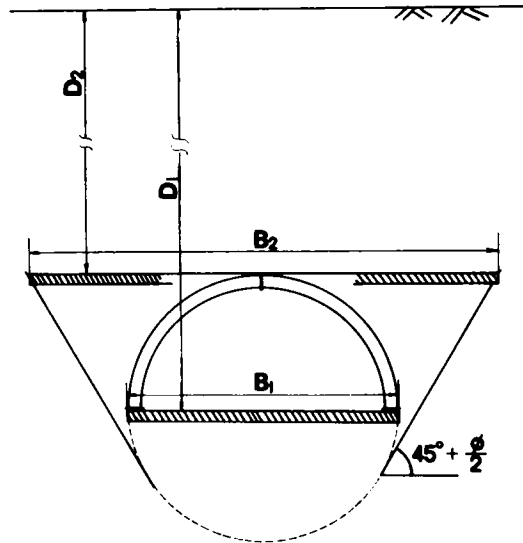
Assumed correspondence between ground loosening in floor-lowering test and ground loosening in actual tunnel excavation.
